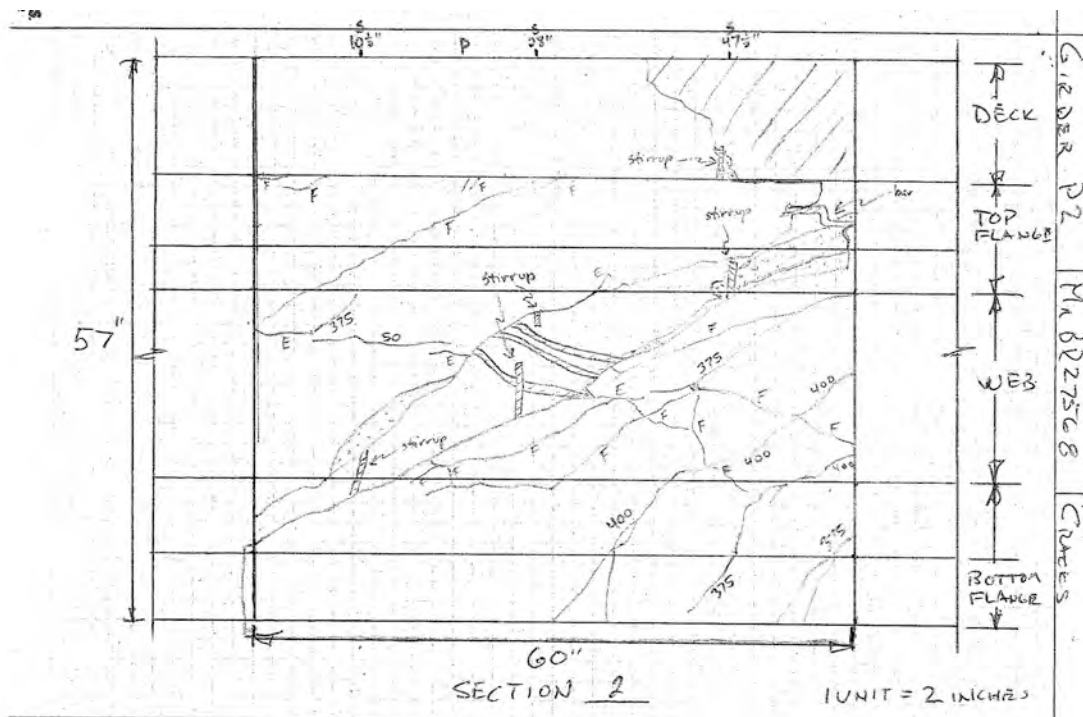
Girder P2 crack pattern – Section 2
